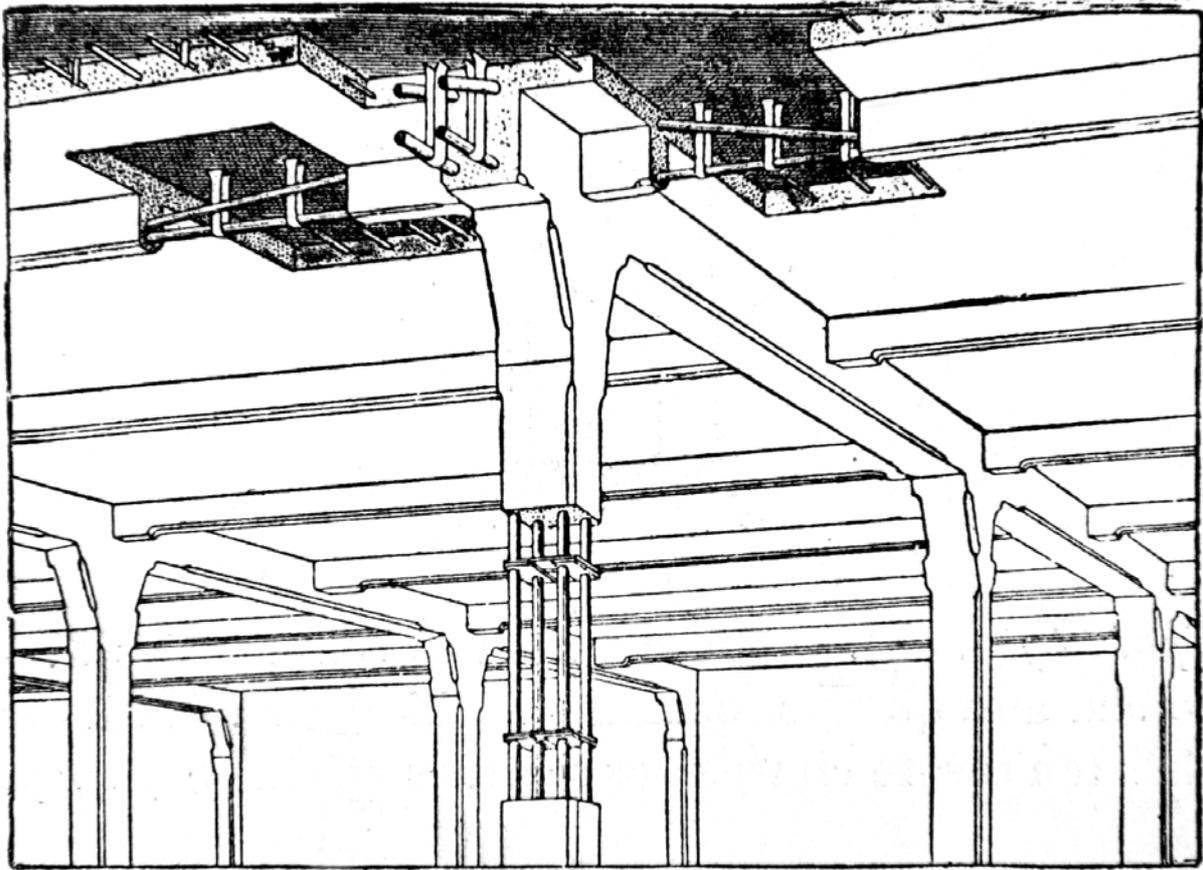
Axonometric view of the Hennebique System of reinforced concrete building construction, patented 1892. (Bosc)
